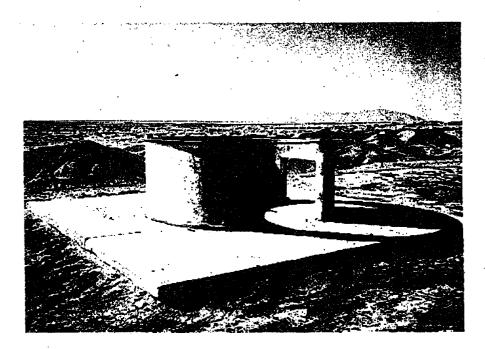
Apperent Tower Base from Former Target Marker in NW 1/4 Section 5. View Northwest.
